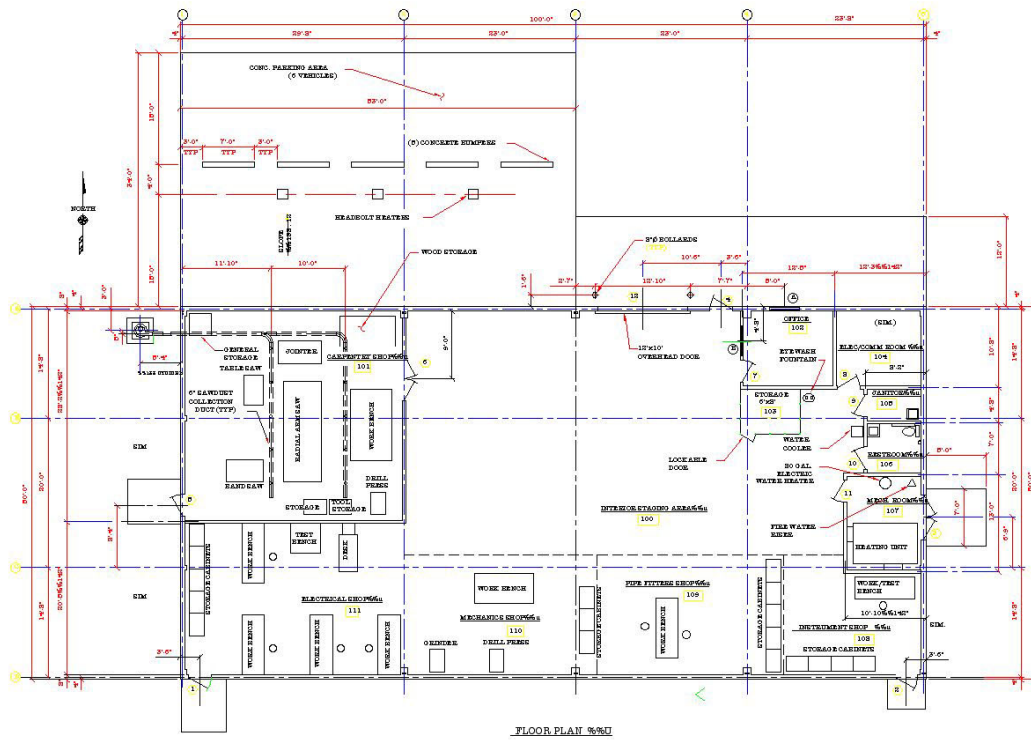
Radioactive Waste Management Complex WMF-656 carpenter shop floor plan.
